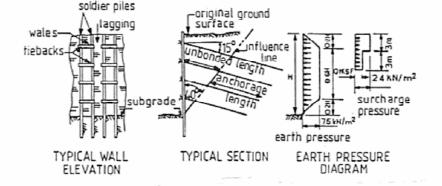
General details of soldier-pile timber-lagged wall (from Hanna, 1982)
